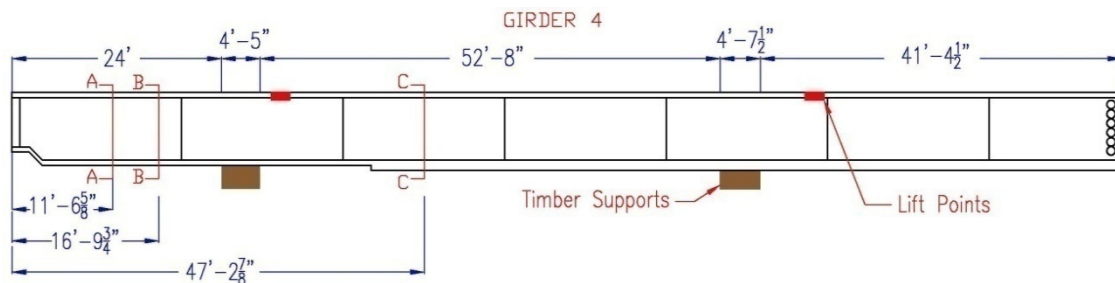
Girder 4 Timber Support Locations w/ Gaged Sections
